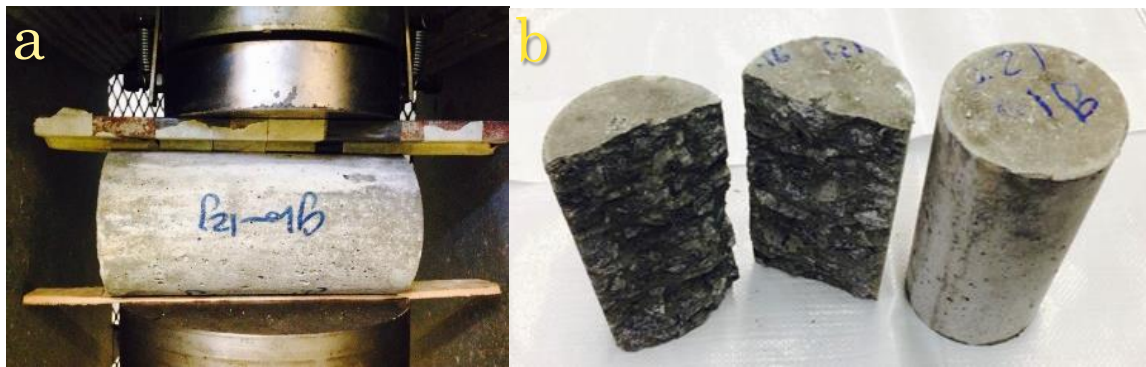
A view of tensile strength test a) under load in universal testing machine b) after the test
